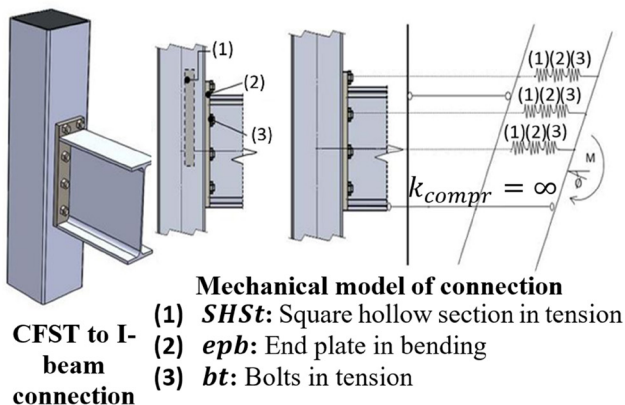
Model for rigidity calculation of the hollow column with concrete
